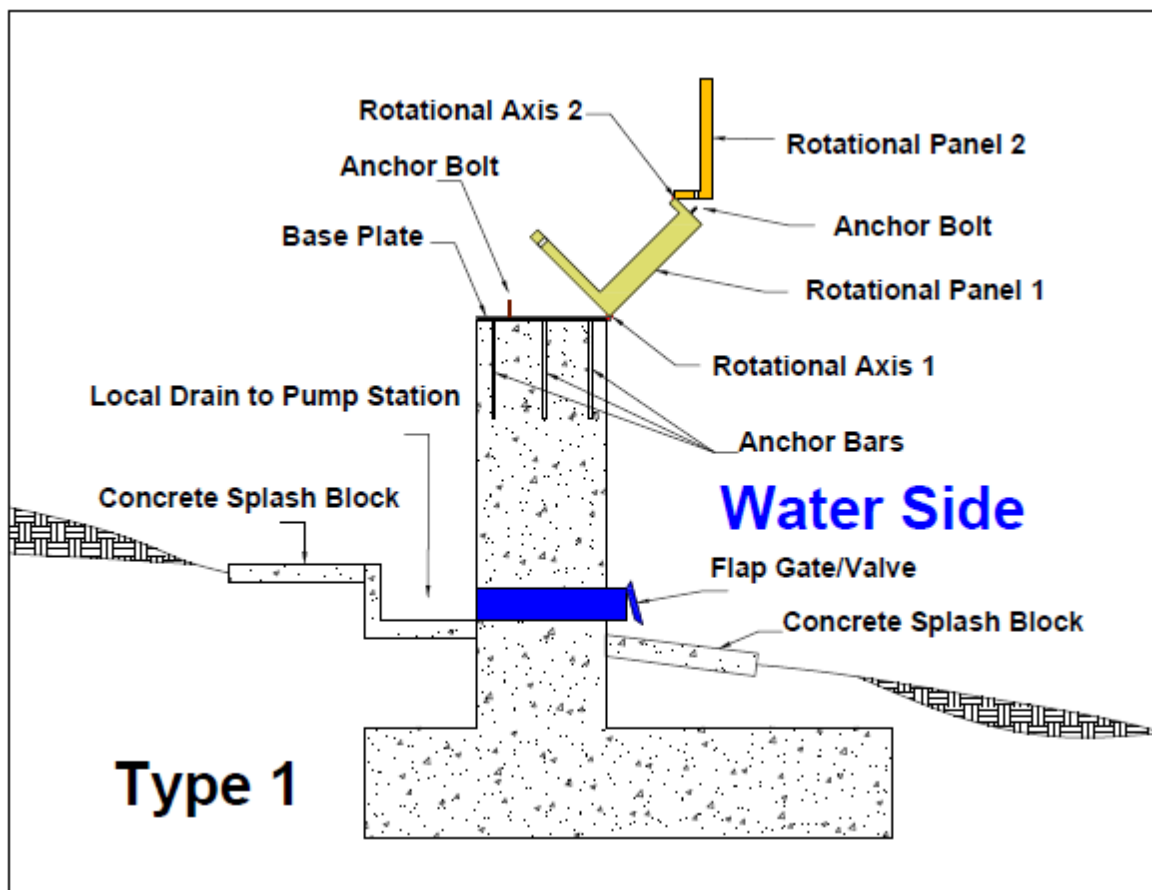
Illustration of Concrete Floodwall with Movable or Removable Panels.
